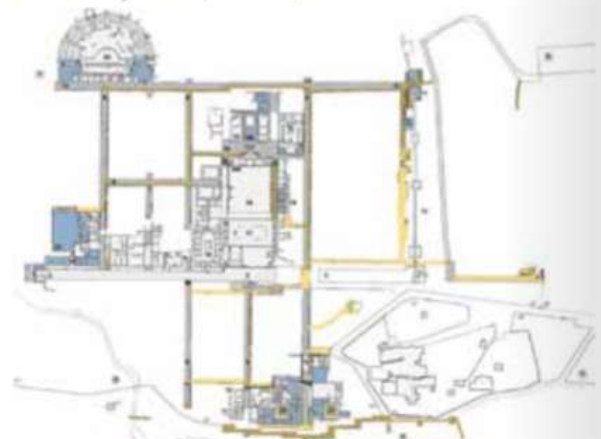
Intervention on the Archaeological Site of Baelo Claudia. General Planimetry
